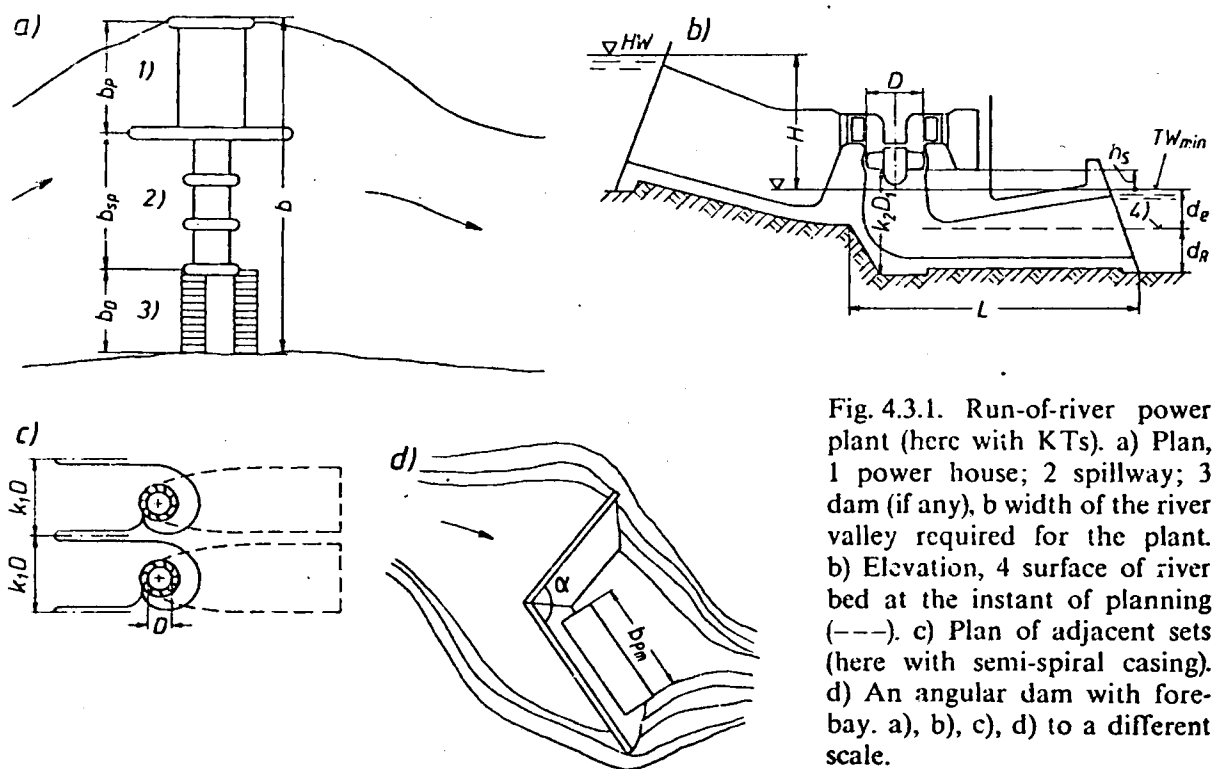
Run-of-river power plant (here with KT's). a) Plan, 1 power house; 2 spillway; 3 dam (if any), b width of the river valley required for the plant. b) Elevation, 4 surface of river bed at the instant of planning (---). c) Plan of adjacent sets (here with semi-spiral casing). d) An angular dam with forebay. a), b), c), d) to a different scale.
